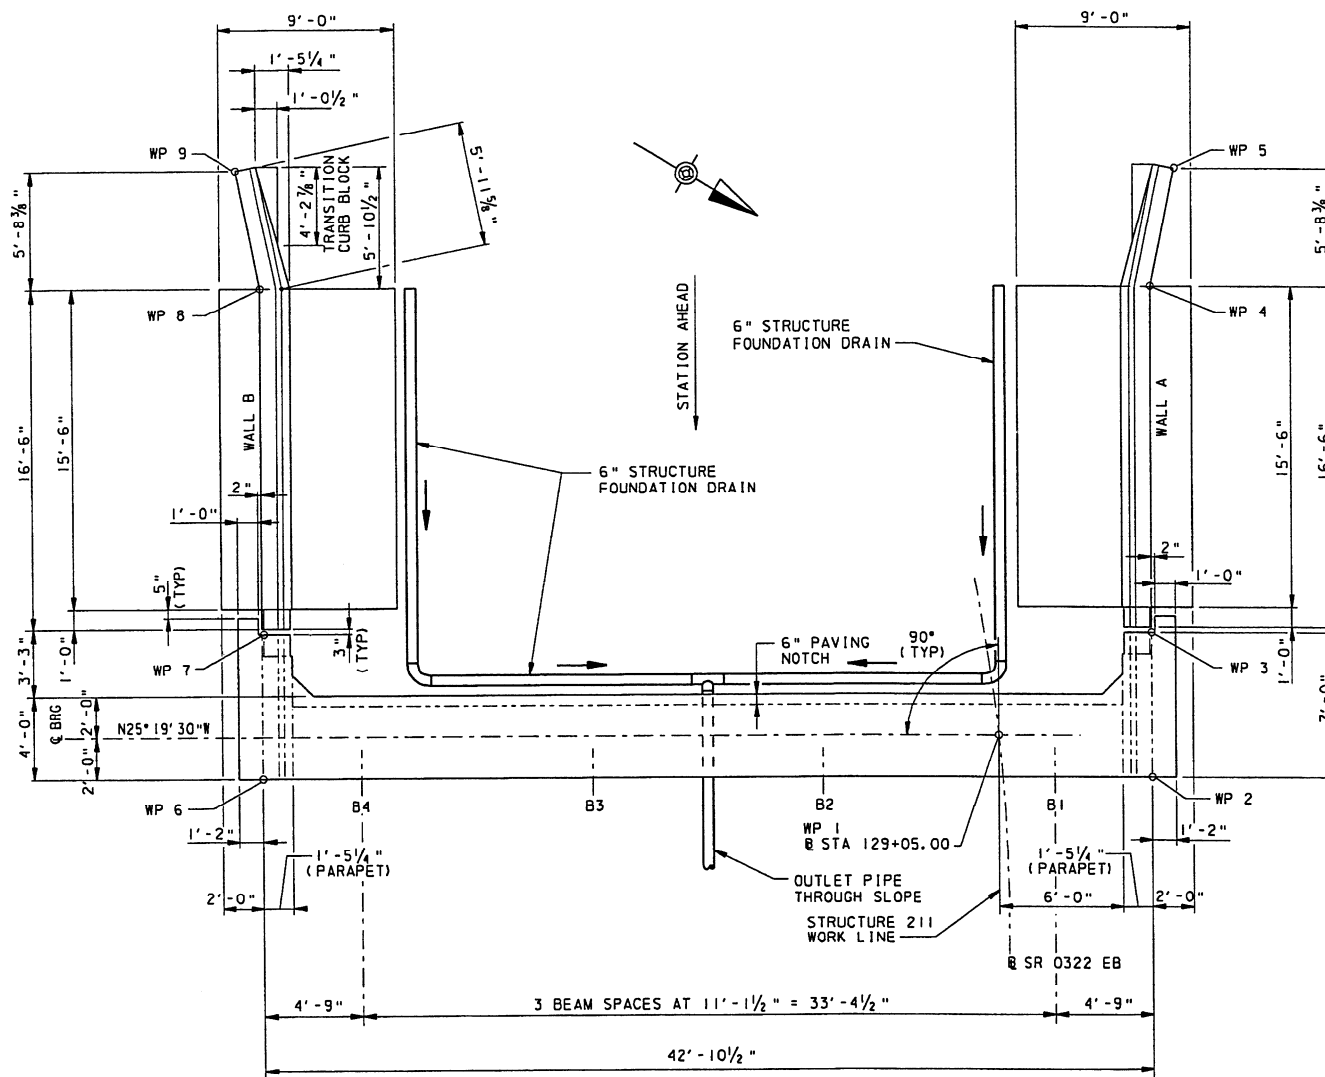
Foundation Plan of Bridge 211 Abutment 1.
